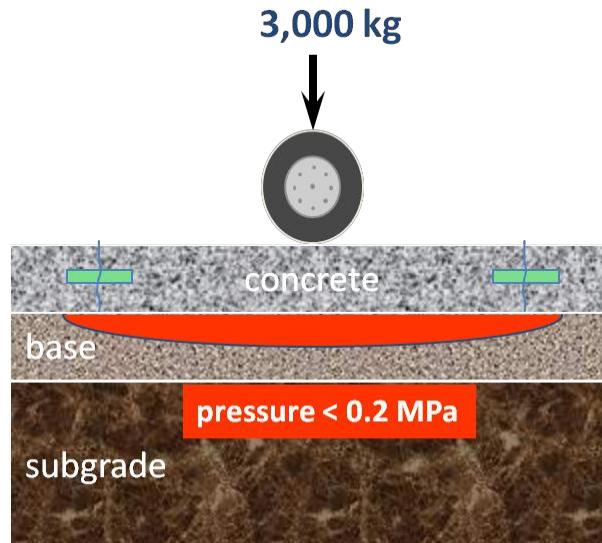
Typical load distribution in a concrete pavement [Smith 2001]
